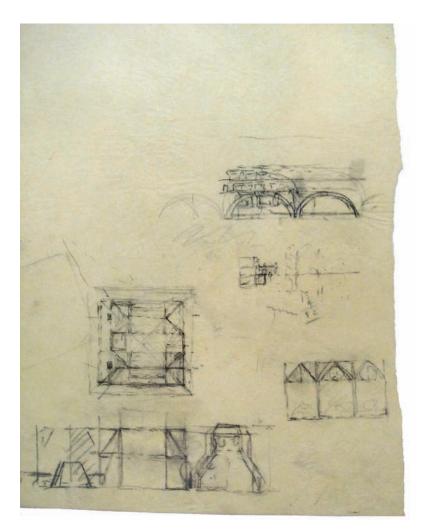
Scheme 3 Elevation Sketch LIK
